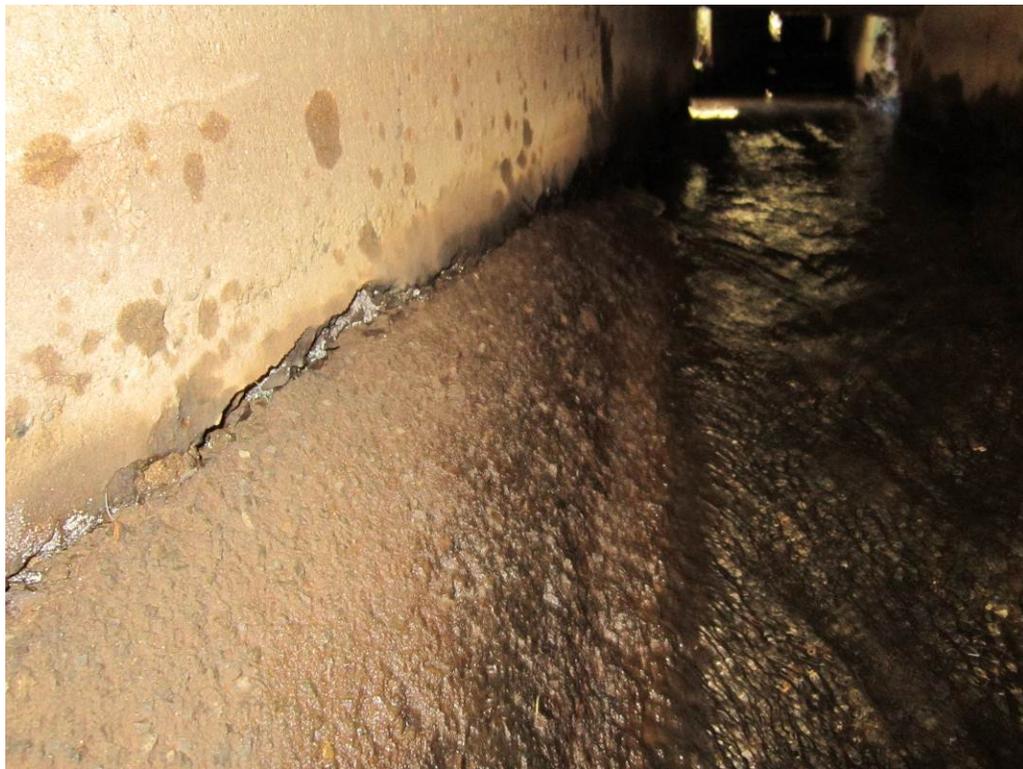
Deep scaling of the north wall of the culvert, near the West Catch Basin chamber
